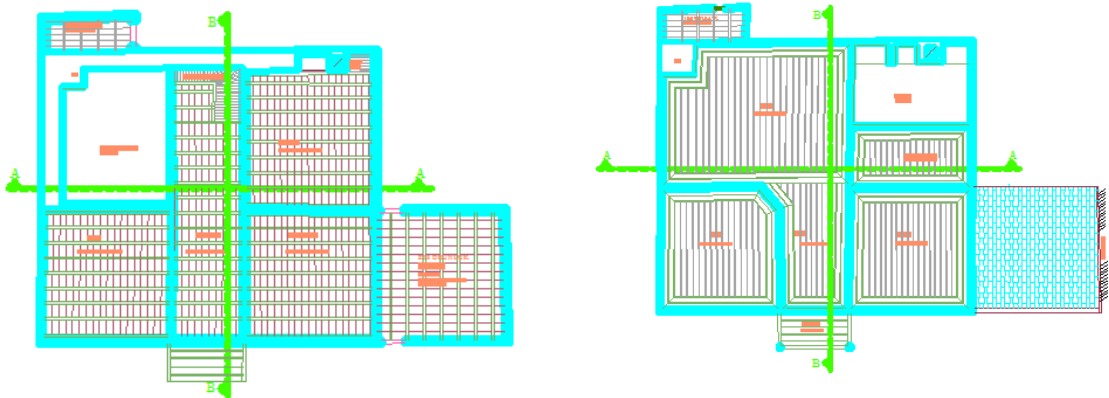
İbrahim Pilavcı House of rolave A-A section and B-B section.
